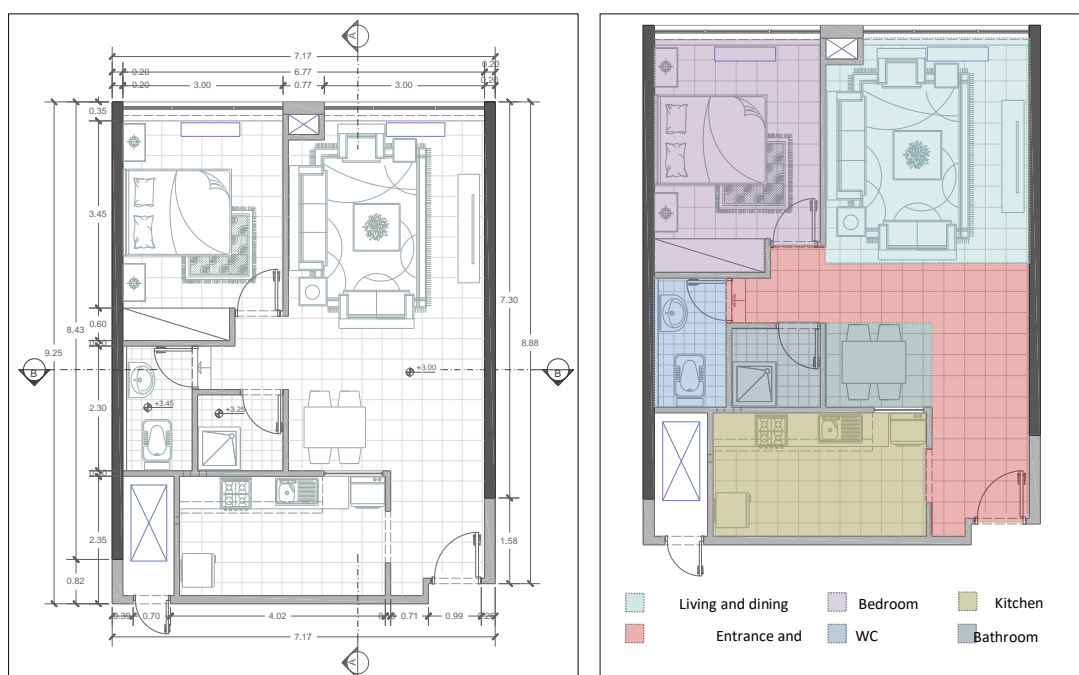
Architectural plan (left); Functional layouts and space distribution (right)
